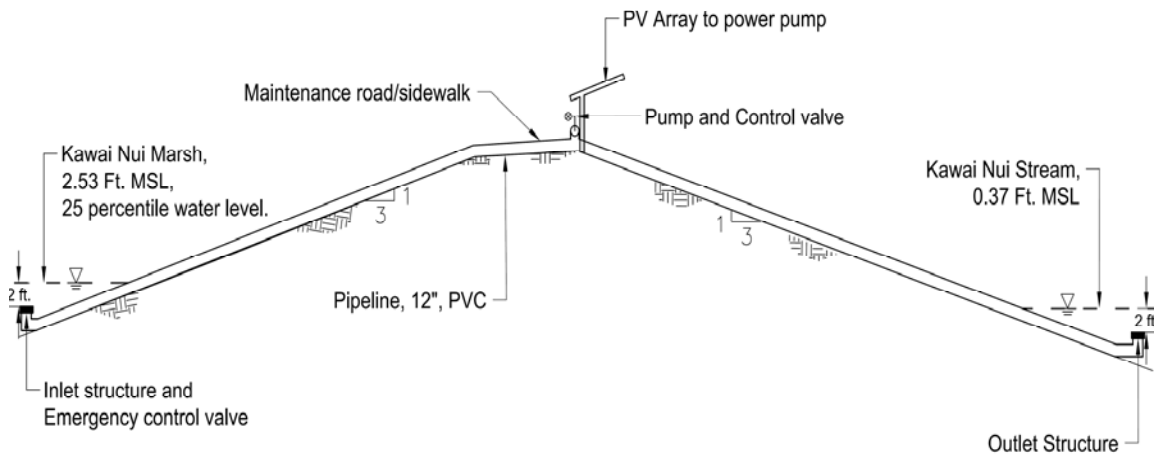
Alt D1, Pump Controlled Pipe over the Levee.
